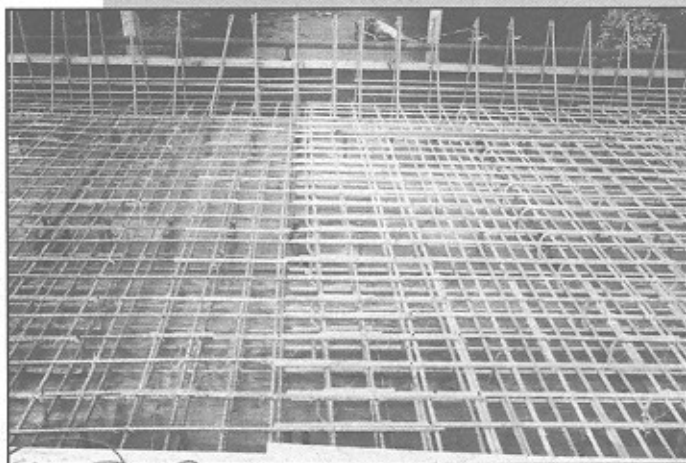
GFRP Bars for Deck Slab of McKinleyville Bridge
